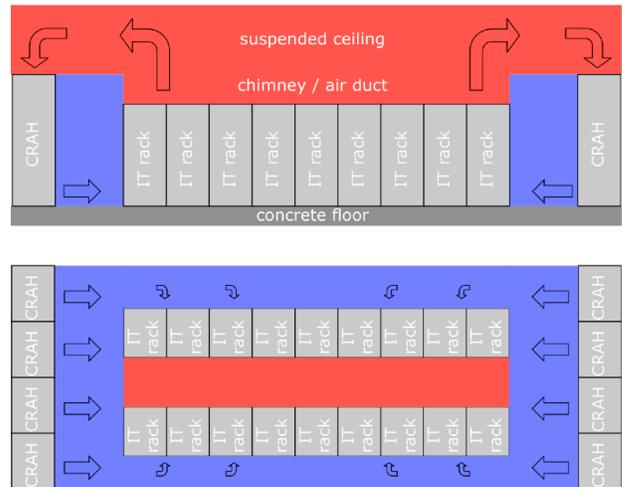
Vertical and horizontal cross-section of a data center room without raised floor; cold air (blue) is transported within the room, hot air (red) is transported within the suspended ceiling
